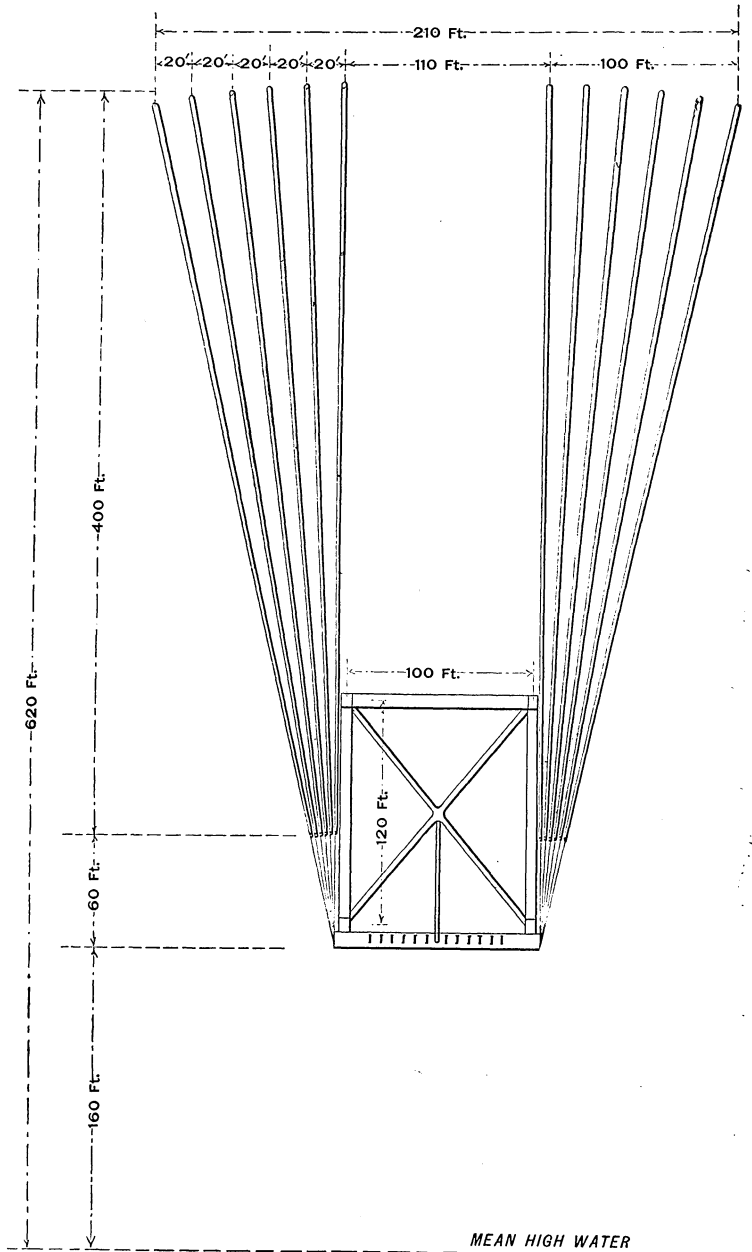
Sectional Elevation through 3100-foot Suspension Bridge at Center.
